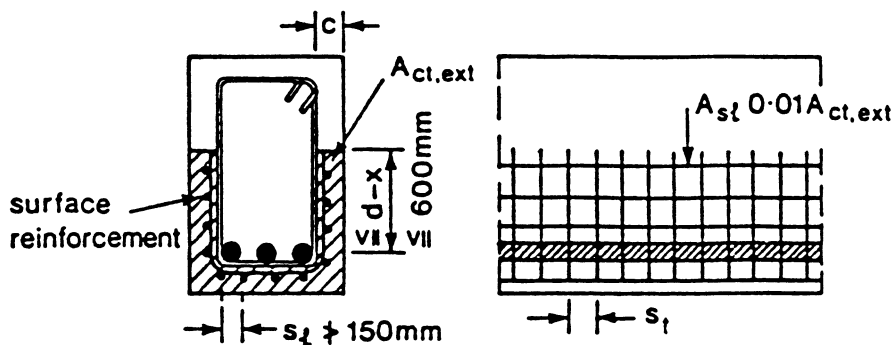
Surface reinforcement as proposed by Eurocode 2.
